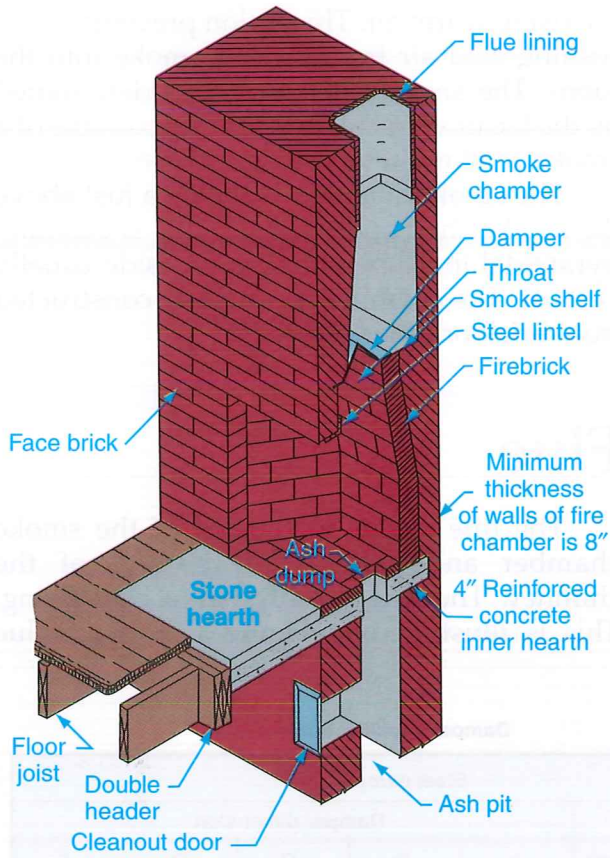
This three-dimensional section drawing of a fireplace shows various details of the construction.
